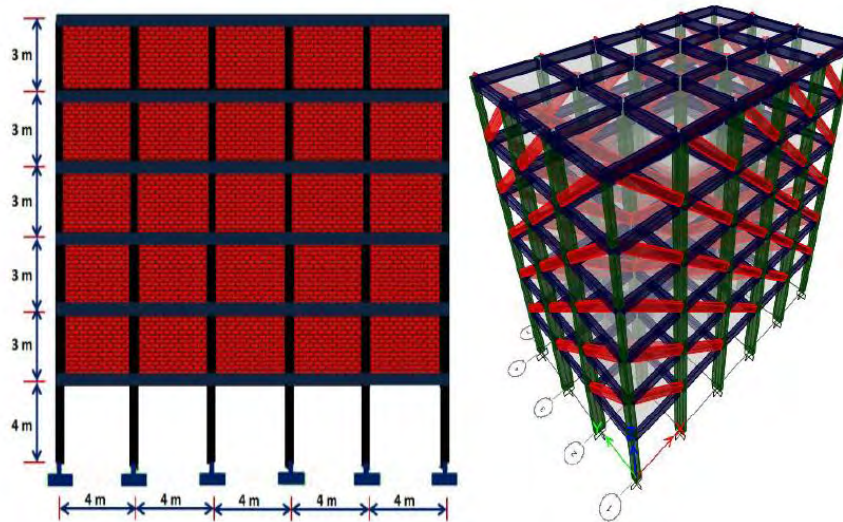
Schematic representation of typical front view and 3-D view of the masonry infill frame building model with open first storey for the 6-storey residential building.
